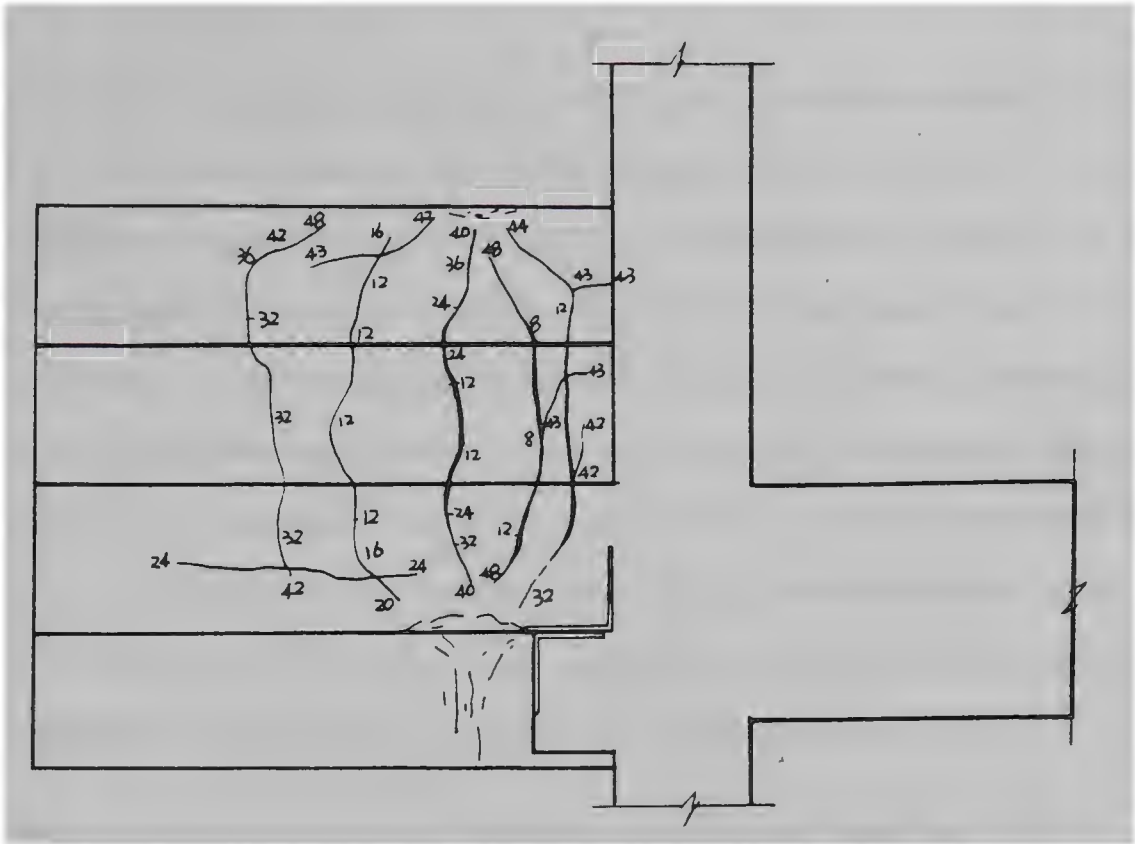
Crack Pattern for Specimen SPB1
